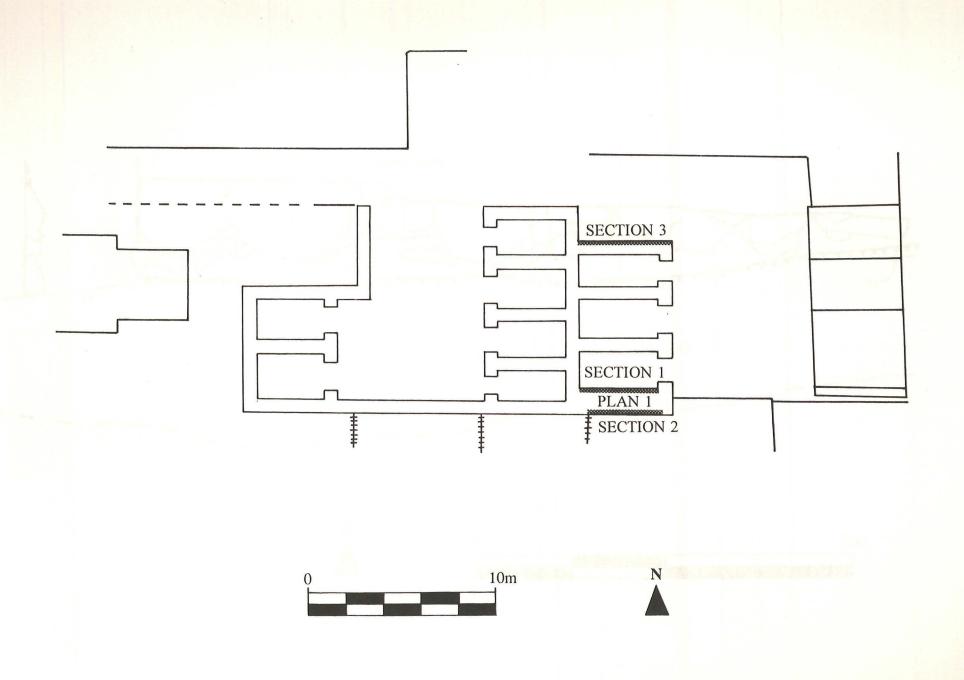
Plan of Southeast Corner of Development area, showing reused ecclesiastical masonry
